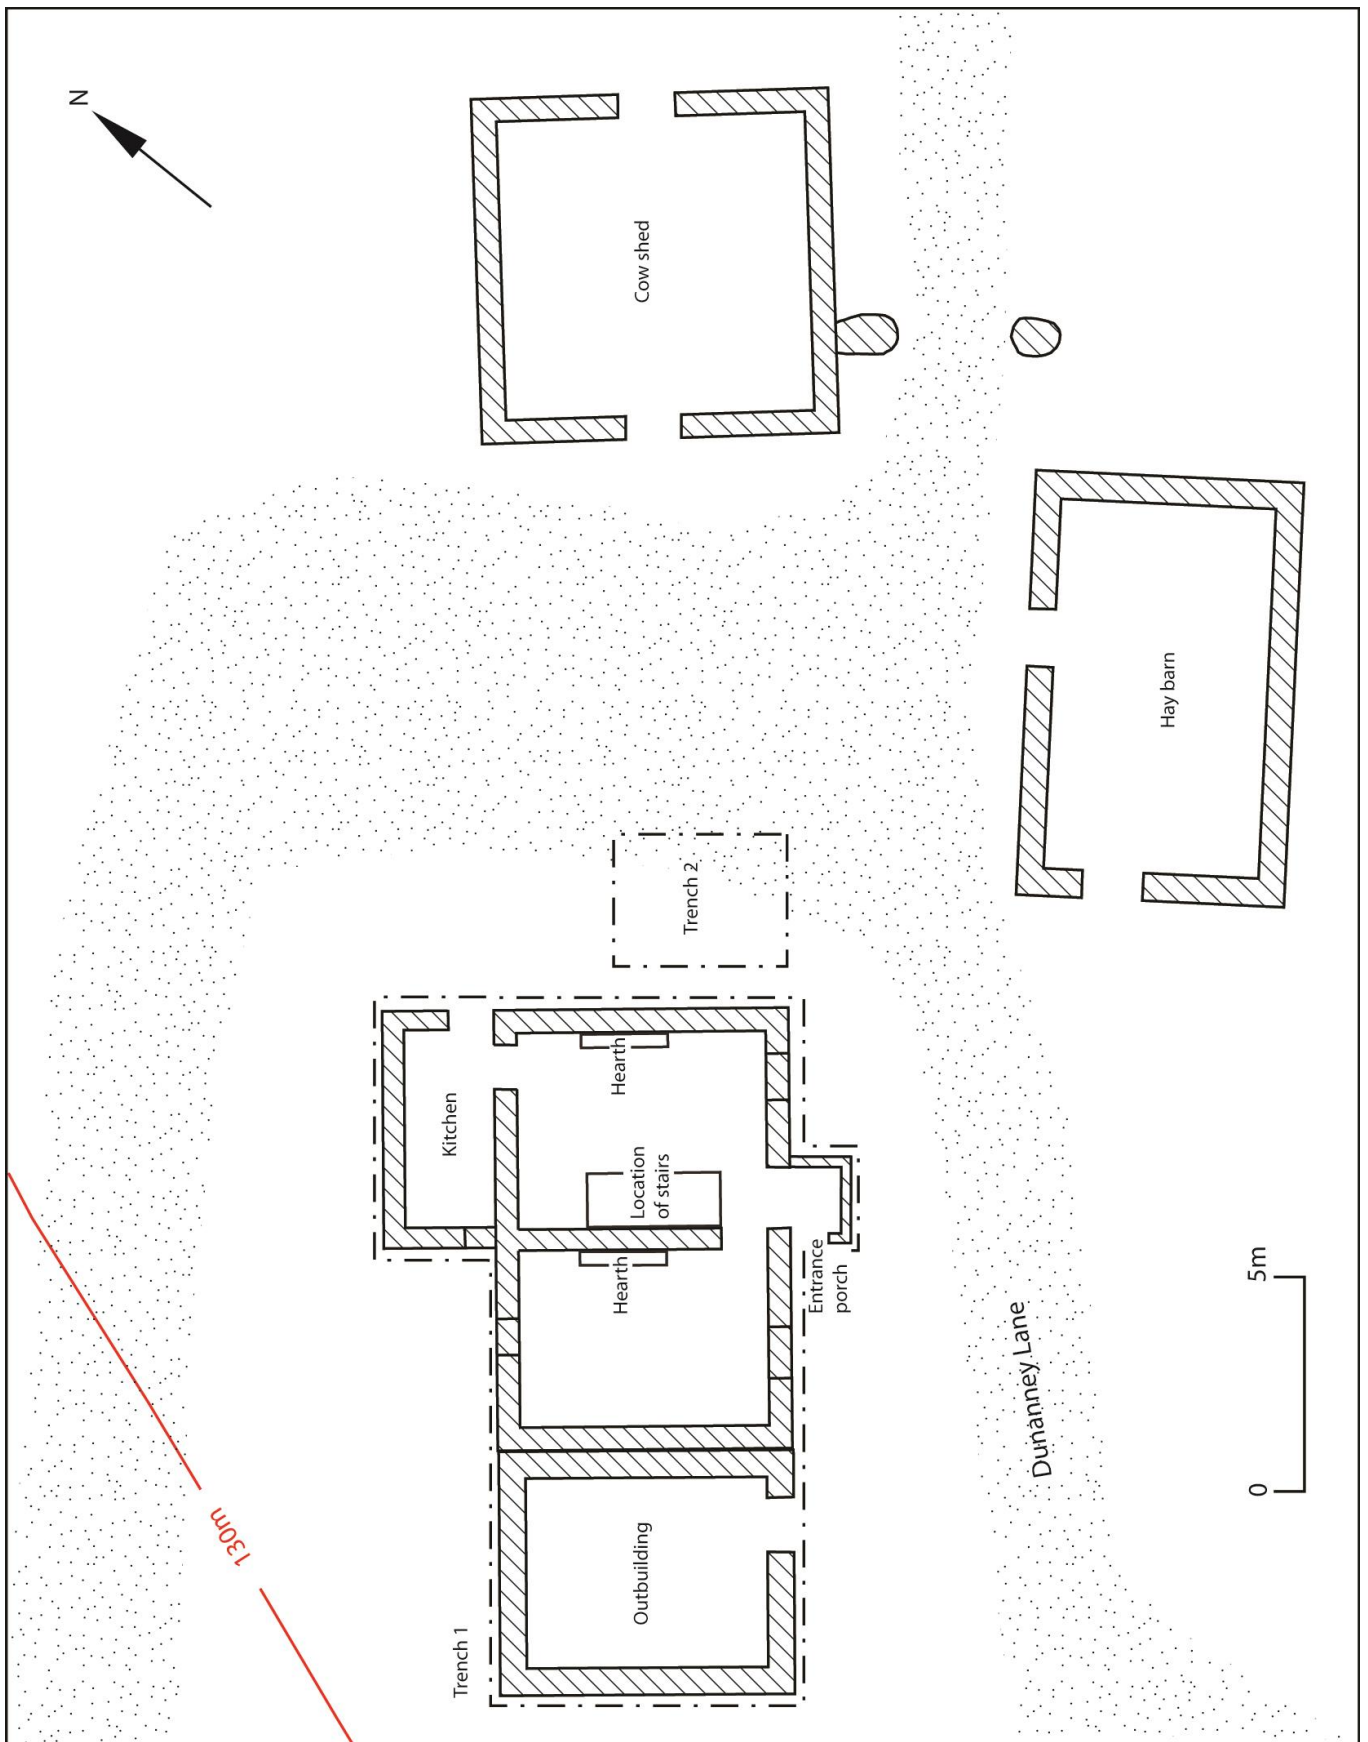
Plan of the vernacular house and outbuildings, showing trenches 1 and 2.
